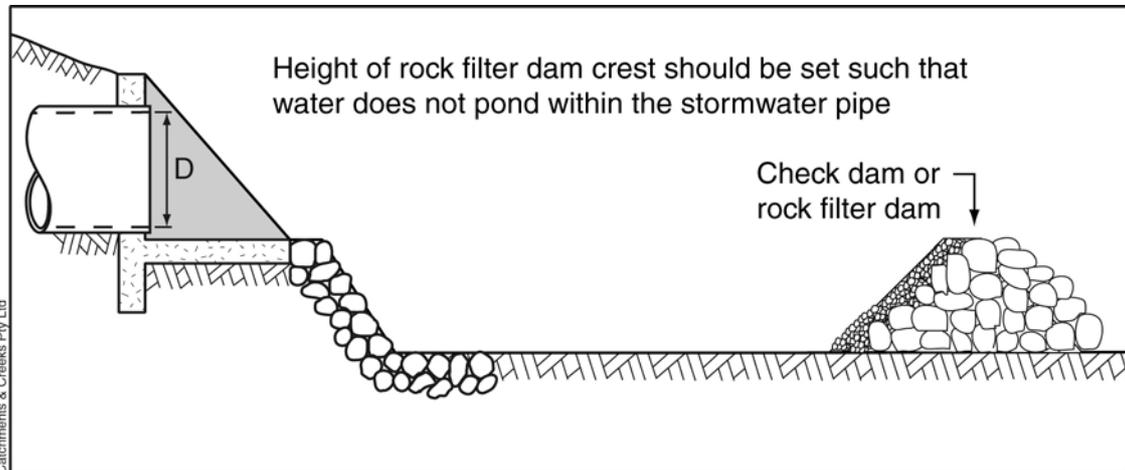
Rock filter dam placed downstream of an elevated stormwater outlet
